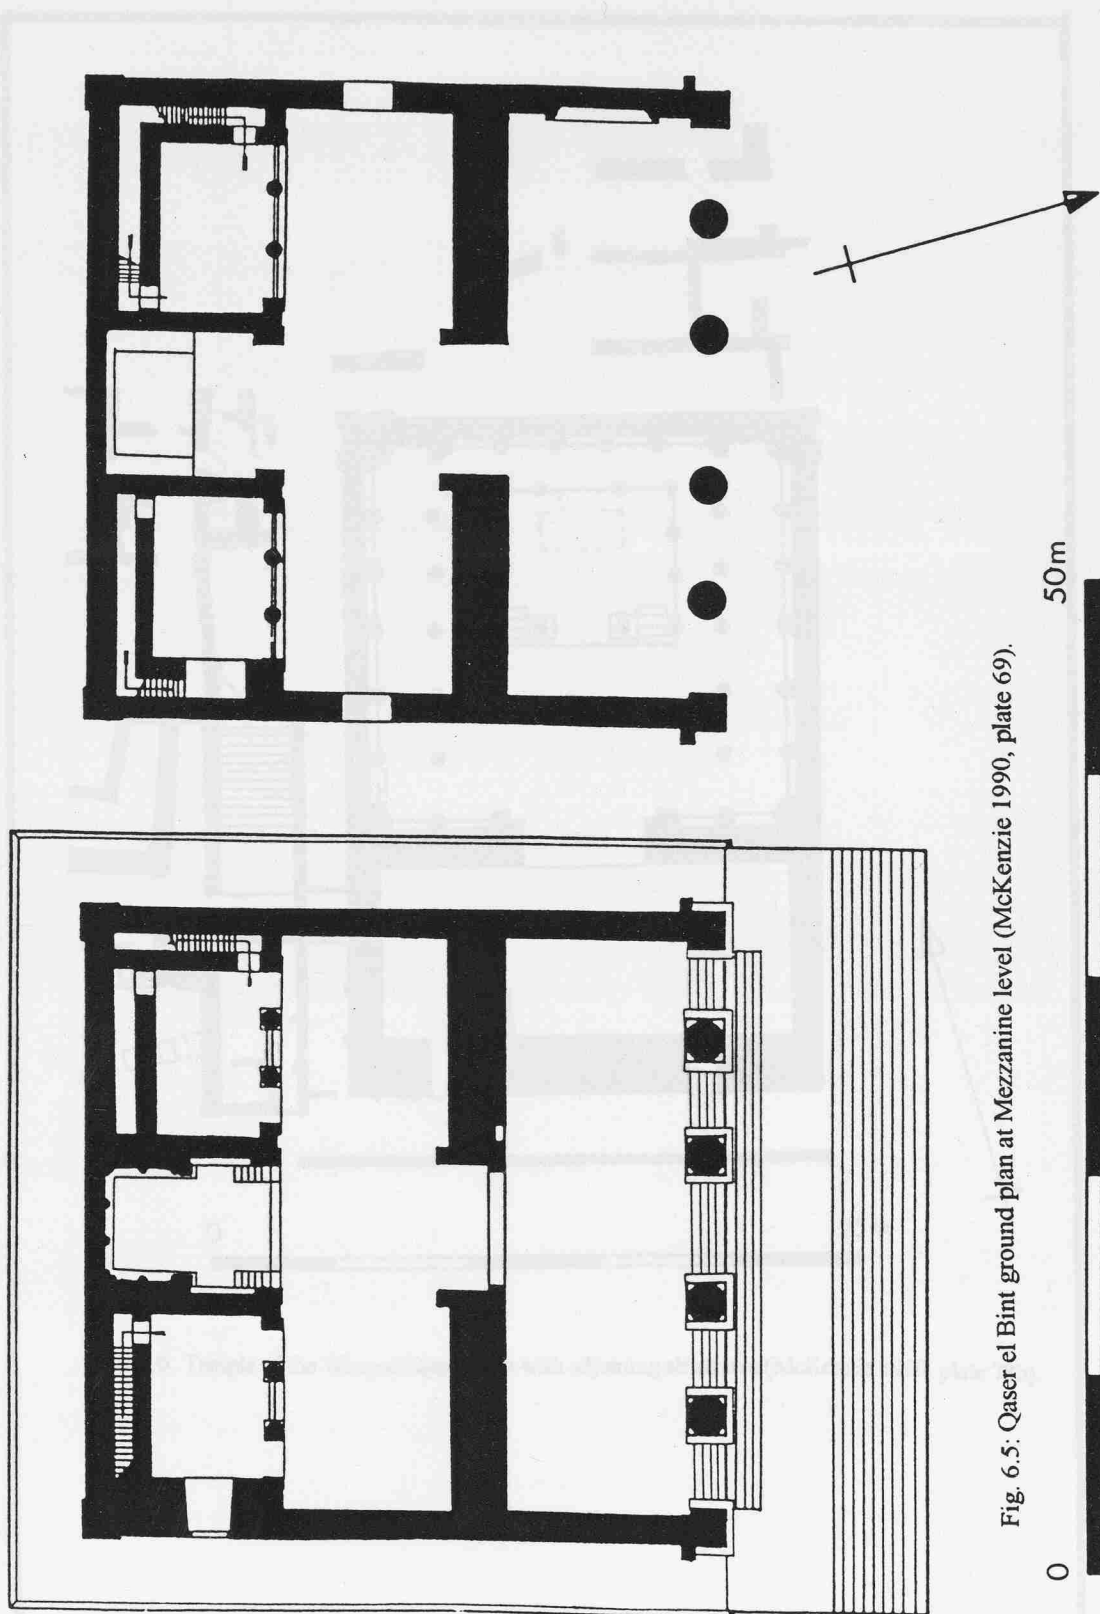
Qaser el Bint ground plan at Mezzanine level (McKenzie 1990, plate 69).
